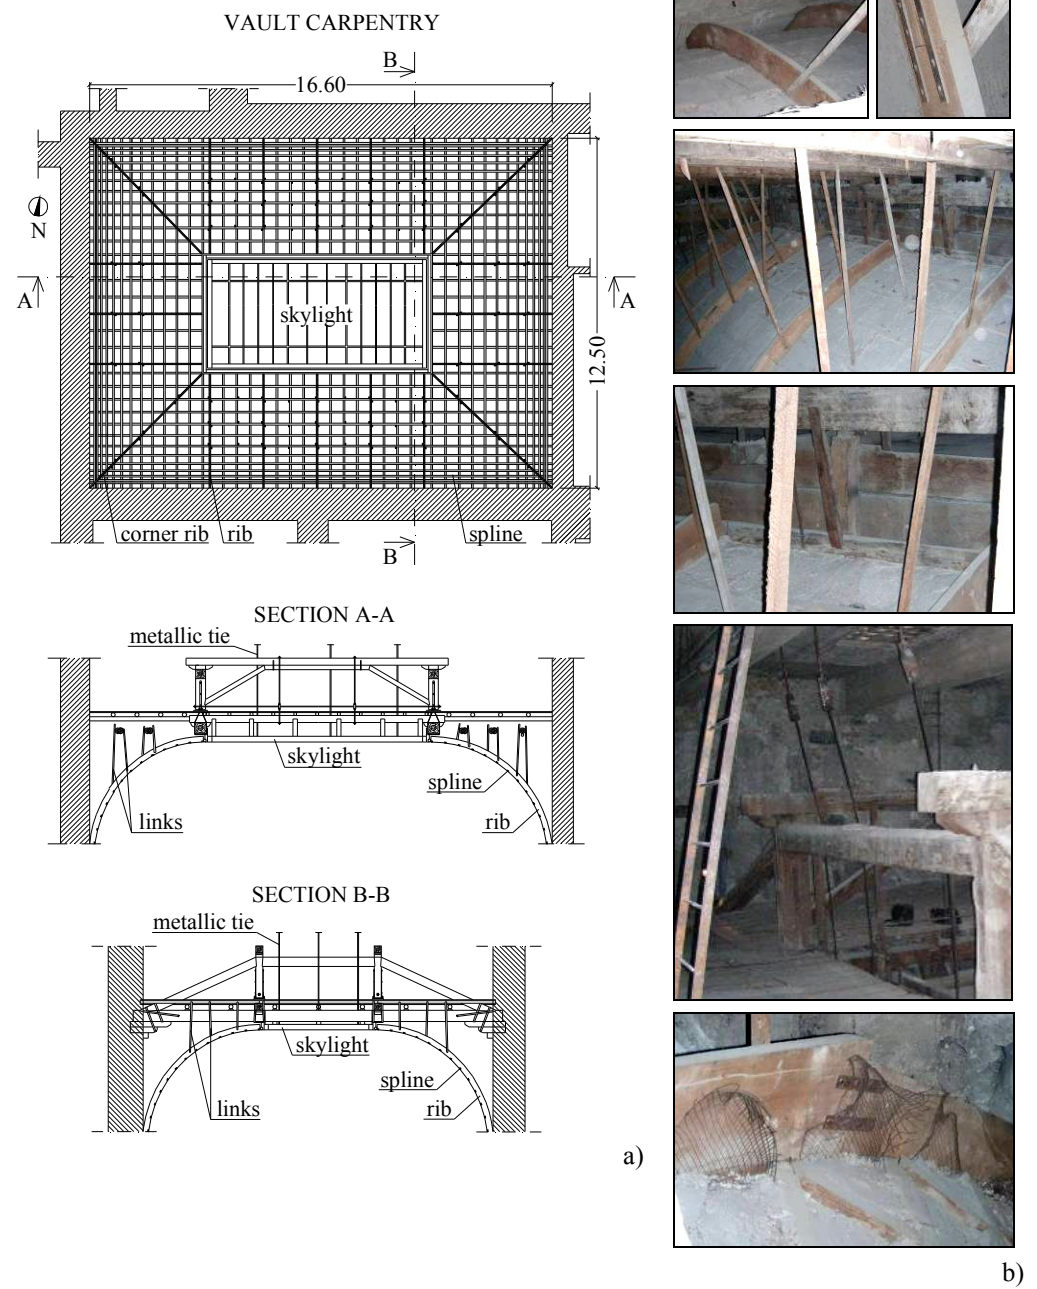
Guard Room (XXIX) – Geometrical survey – Vault structure: a) Carpentry and structural sections [m]; b) Photographic survey.
